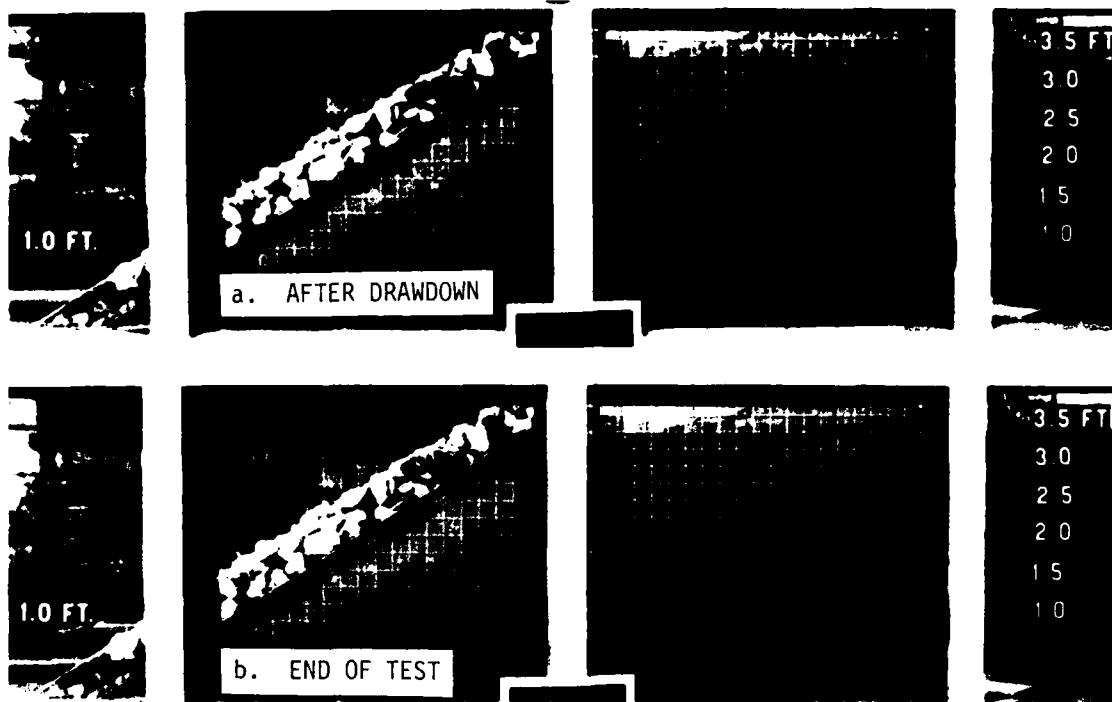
Plan 3, after drawdown and at end of the 4.0-ft/hr drawdown test
